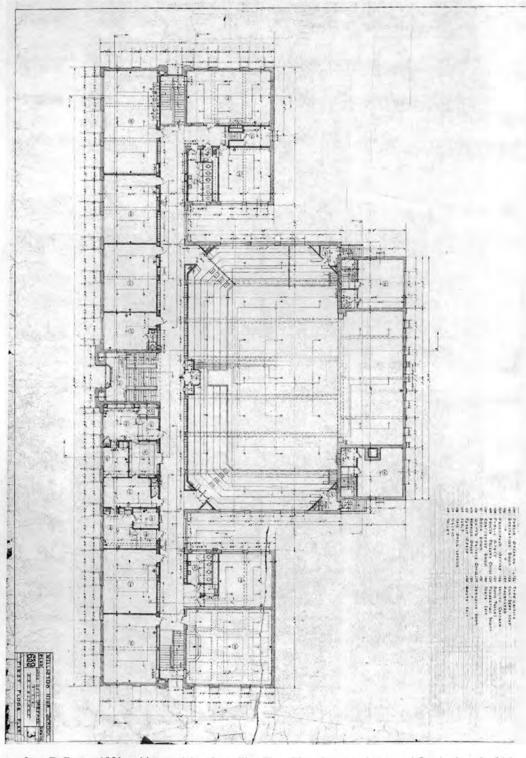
excernt from DeRemer 1931 architectural drawings: First Floor Plan above grade (second floor): sheet 3 of 16
